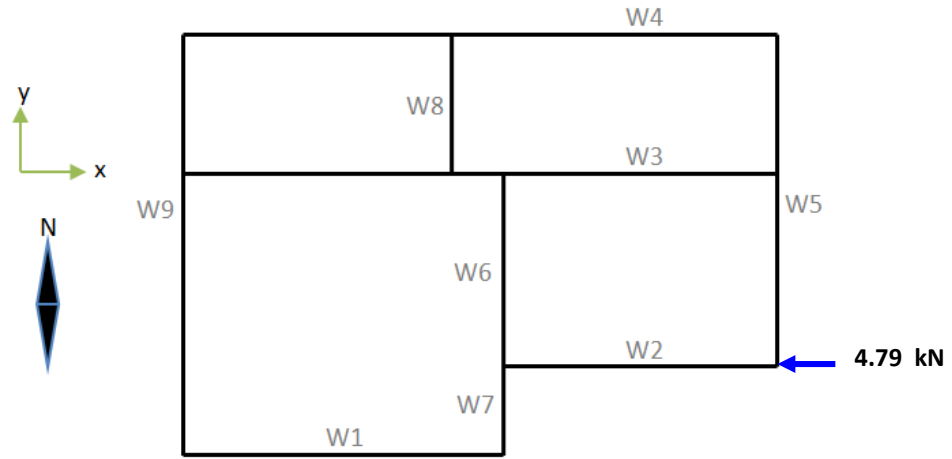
Load Case 3 – 4.79 kN Applied to Top-Plate at Wall 2
